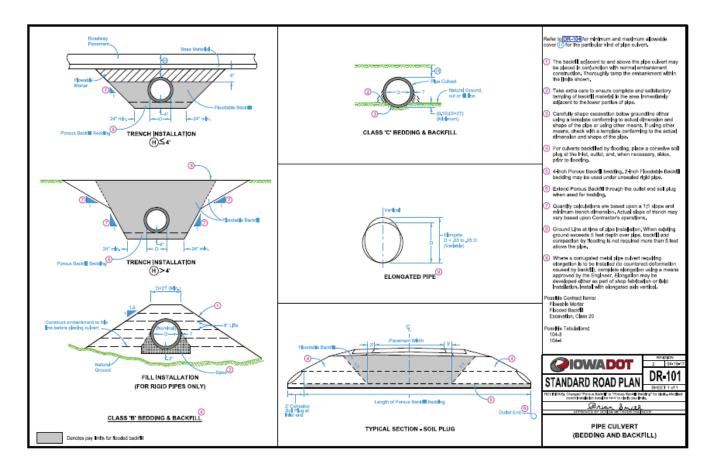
Standard Road Plan DR-101 showing both trench and fill installations of culvert pipe.
